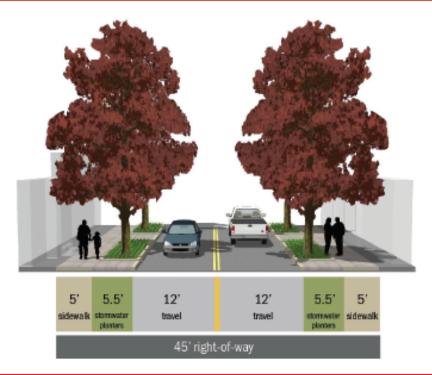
Figure X. Conceptual Cross-Section for Ochoco Street - East of Main Street within existing right-of-way (looking east)
